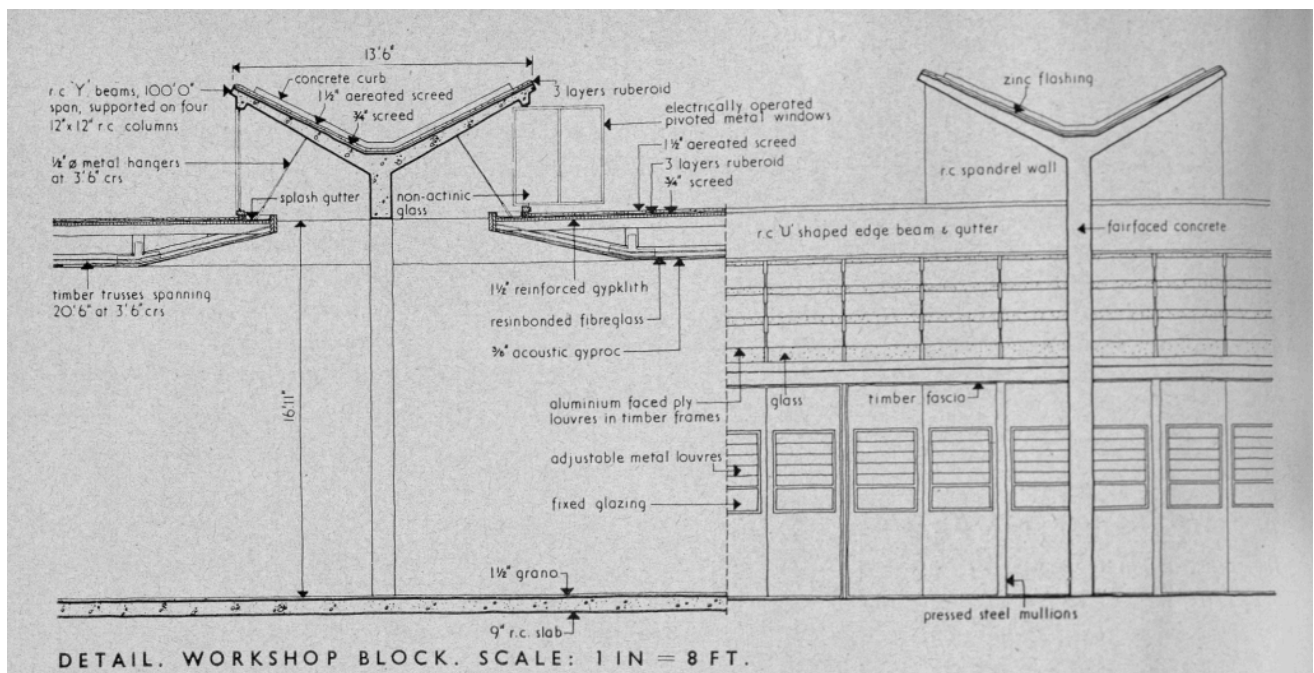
Section diagram of the 'Y' structural features in the engineering building.¹⁶⁰
